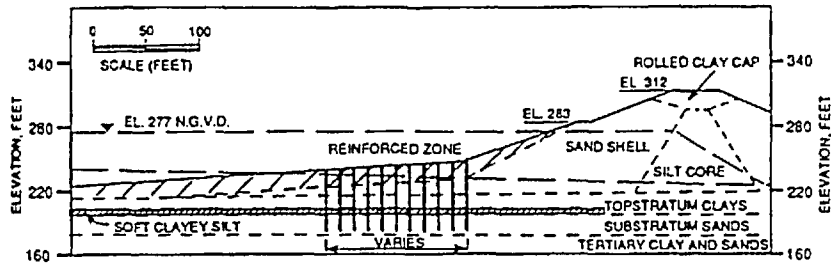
Sardis Dam upstream cross-section and reinforced zone
